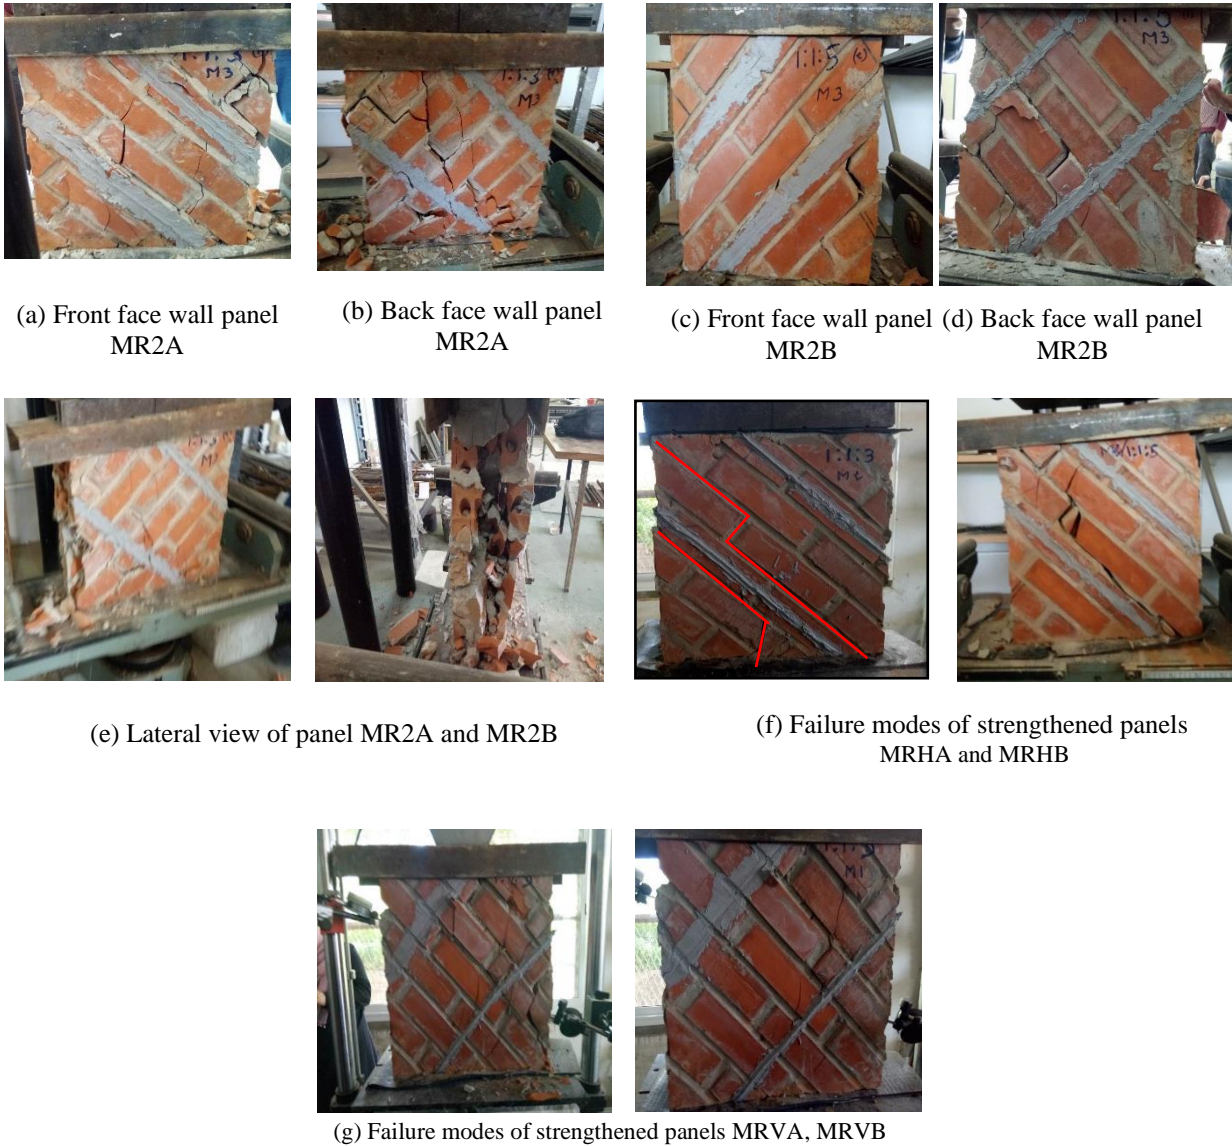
Failure modes of all strengthened masonry panels
